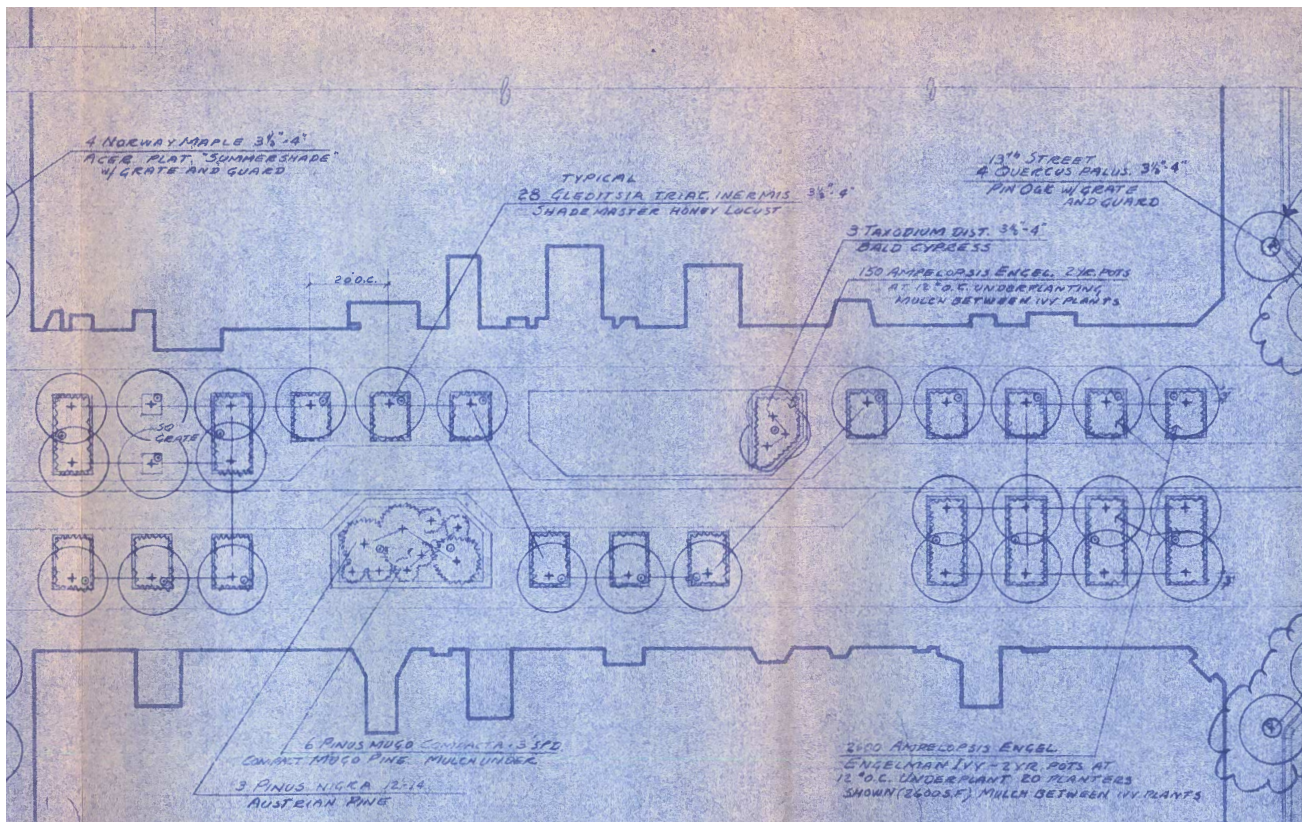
Pearl Street Mall construction documents planting plan 1200 Block, 1976 (source: City of Boulder)
